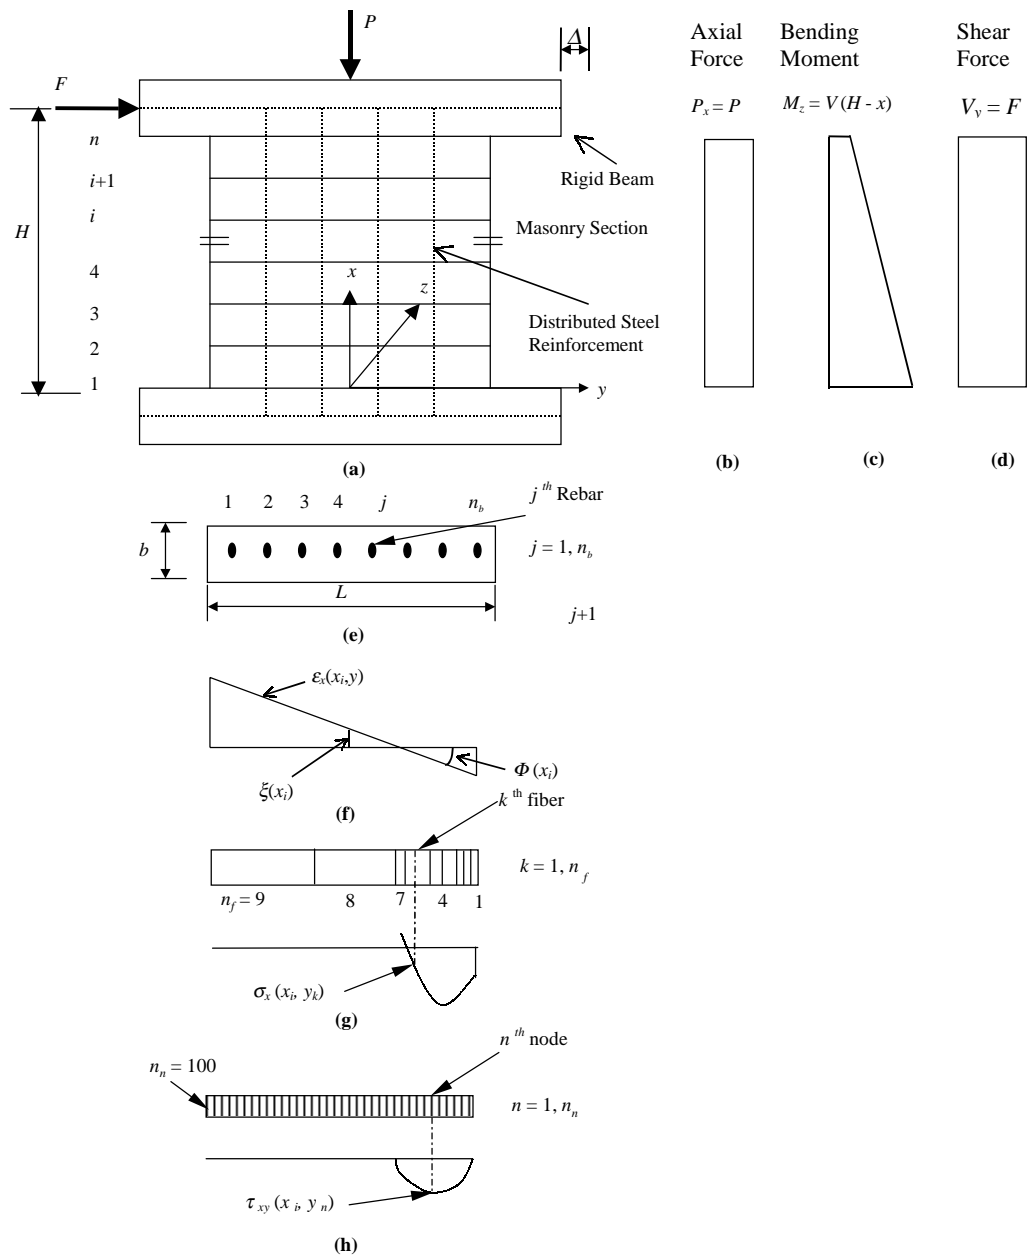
Concrete Masonry Shear Wall with Distributed Vertical Reinforcement: Geometry, Behavior and Modeling
